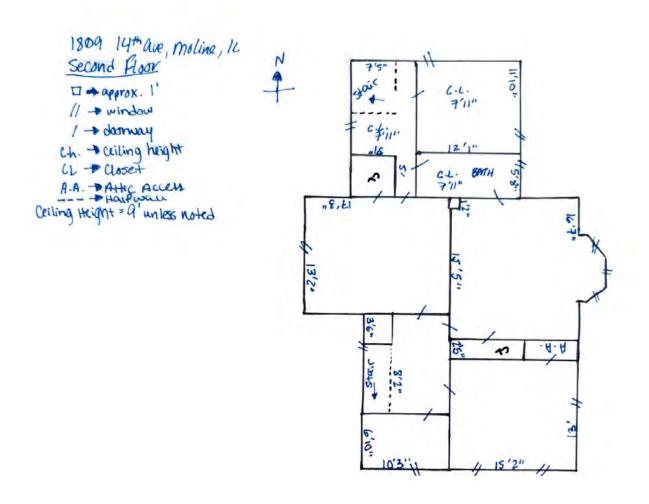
1809 14th Ave, Moline, Illinois, second story floor plan, Terracon Consultants, Inc., 2025
